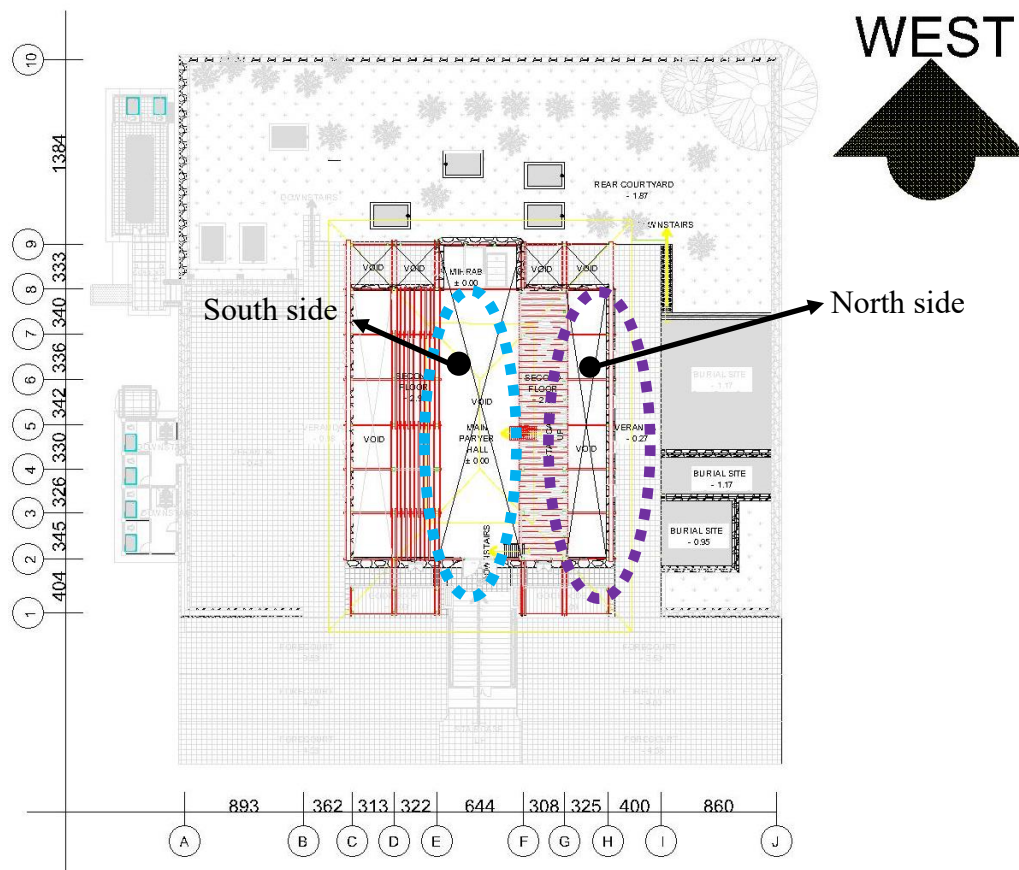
Second Floor Plan of TGMBS (Scale 1:100) (Source: Authors, 2026).
